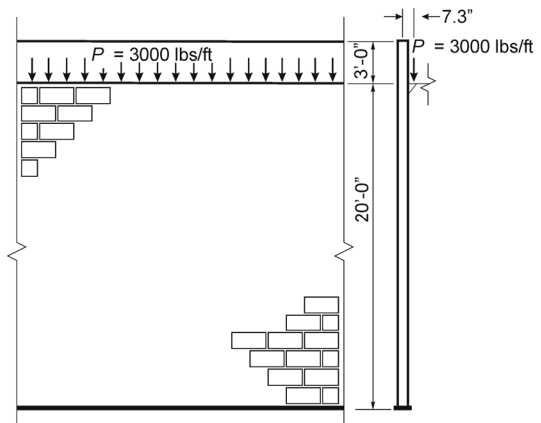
Masonry Wall Under High Axial Loads: Front and Side Views
